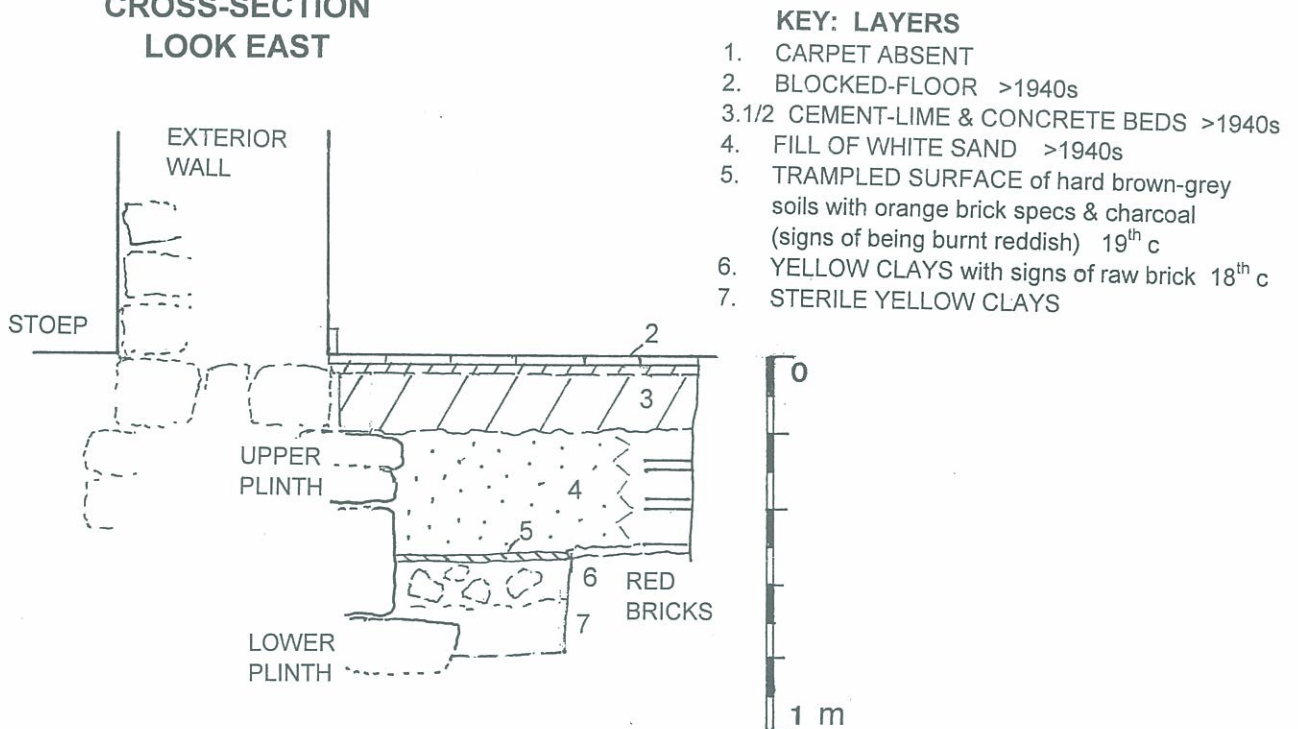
Elevation of the excavation C1/2, till the sterile clays at the base.
